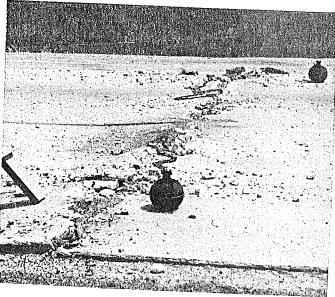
Joint blowup. The localized buckling or shattering of a rigid pavement at a joint caused by excessive longitudinal pressure.
